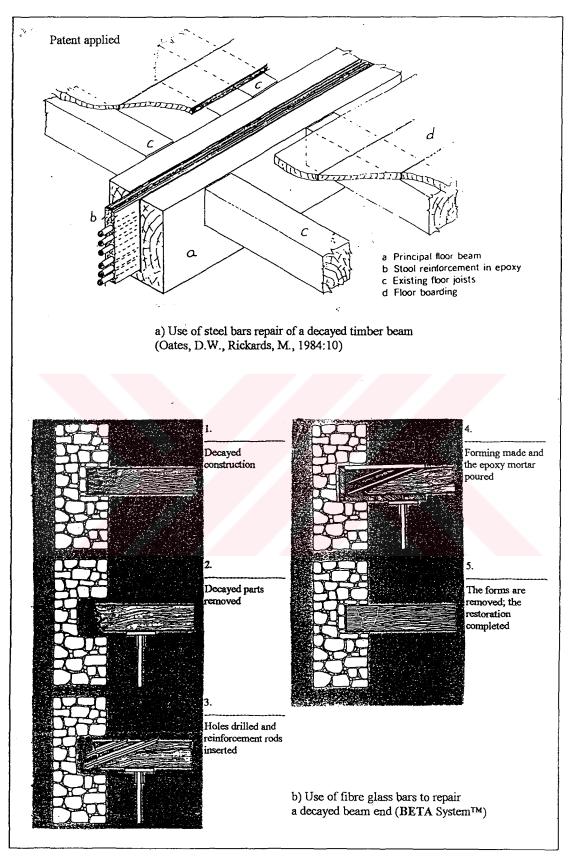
Reinforcement of a Decayed Timber Member with Steel and Fiber Glass Bars
